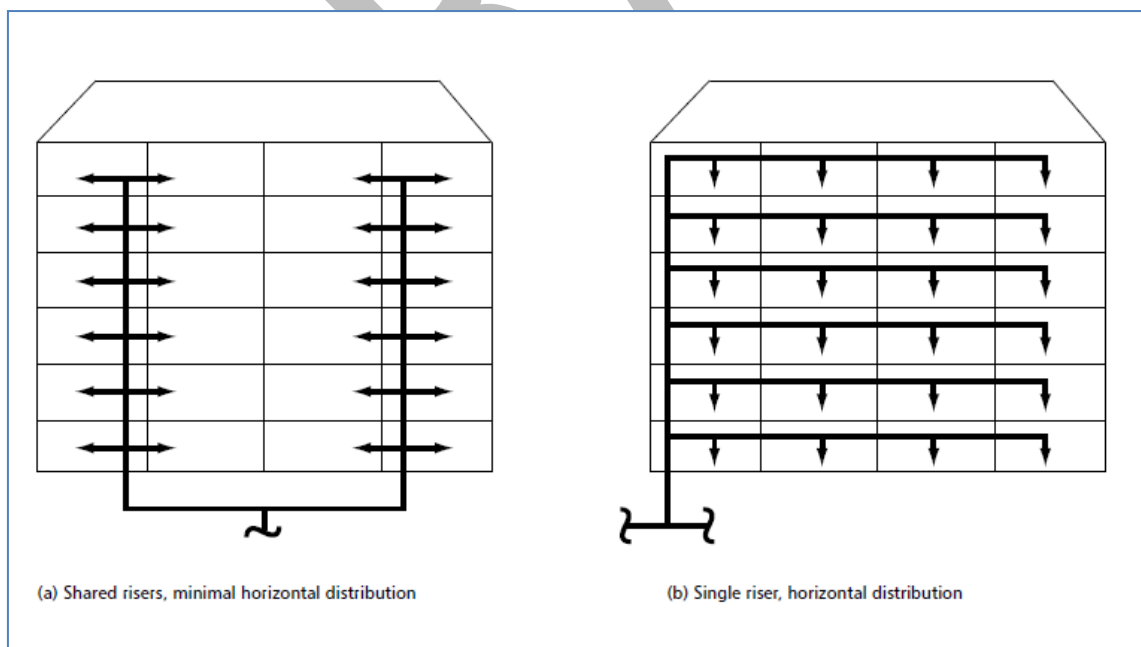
Benefits of using shared risers compared to horizontal runs for typical flat layouts
